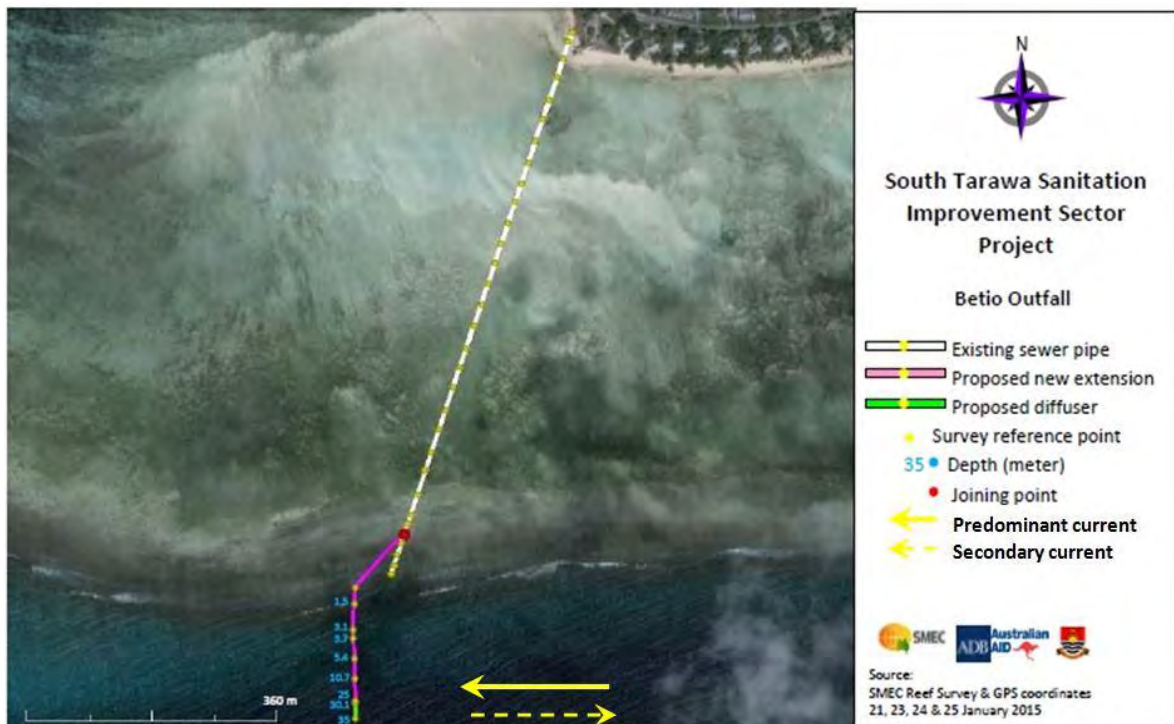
Existing Outfall Pipe and Proposed Extension at Betio (note: reference depths not corrected for 0 datum)
